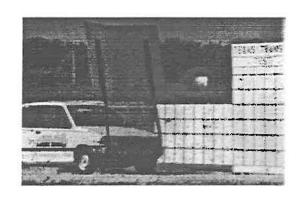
Sequential photographs for test 405231-9 (continued). (perpendicular and angular views)
